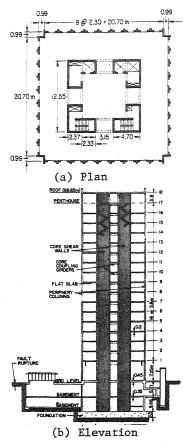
PLAN AND ELEVATION OF BANCO DE AMERICA
